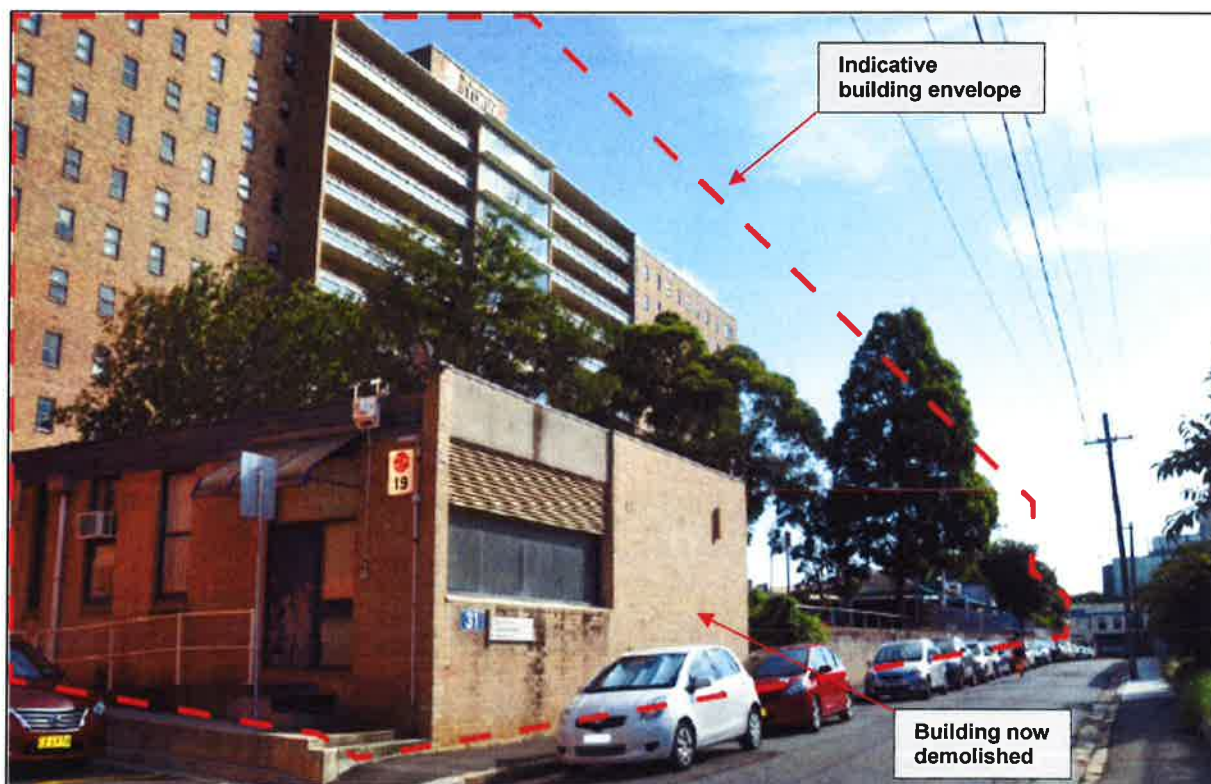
Indicative building envelope, viewed from Lucas Street looking east (source: EIS)
